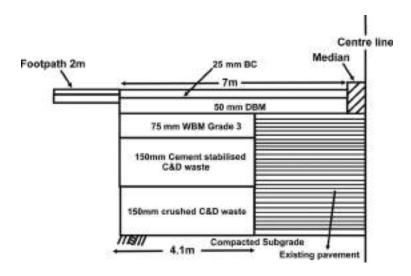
Typical Cross Section of C&D Waste Test Road (Widening Portion) in Delhi
